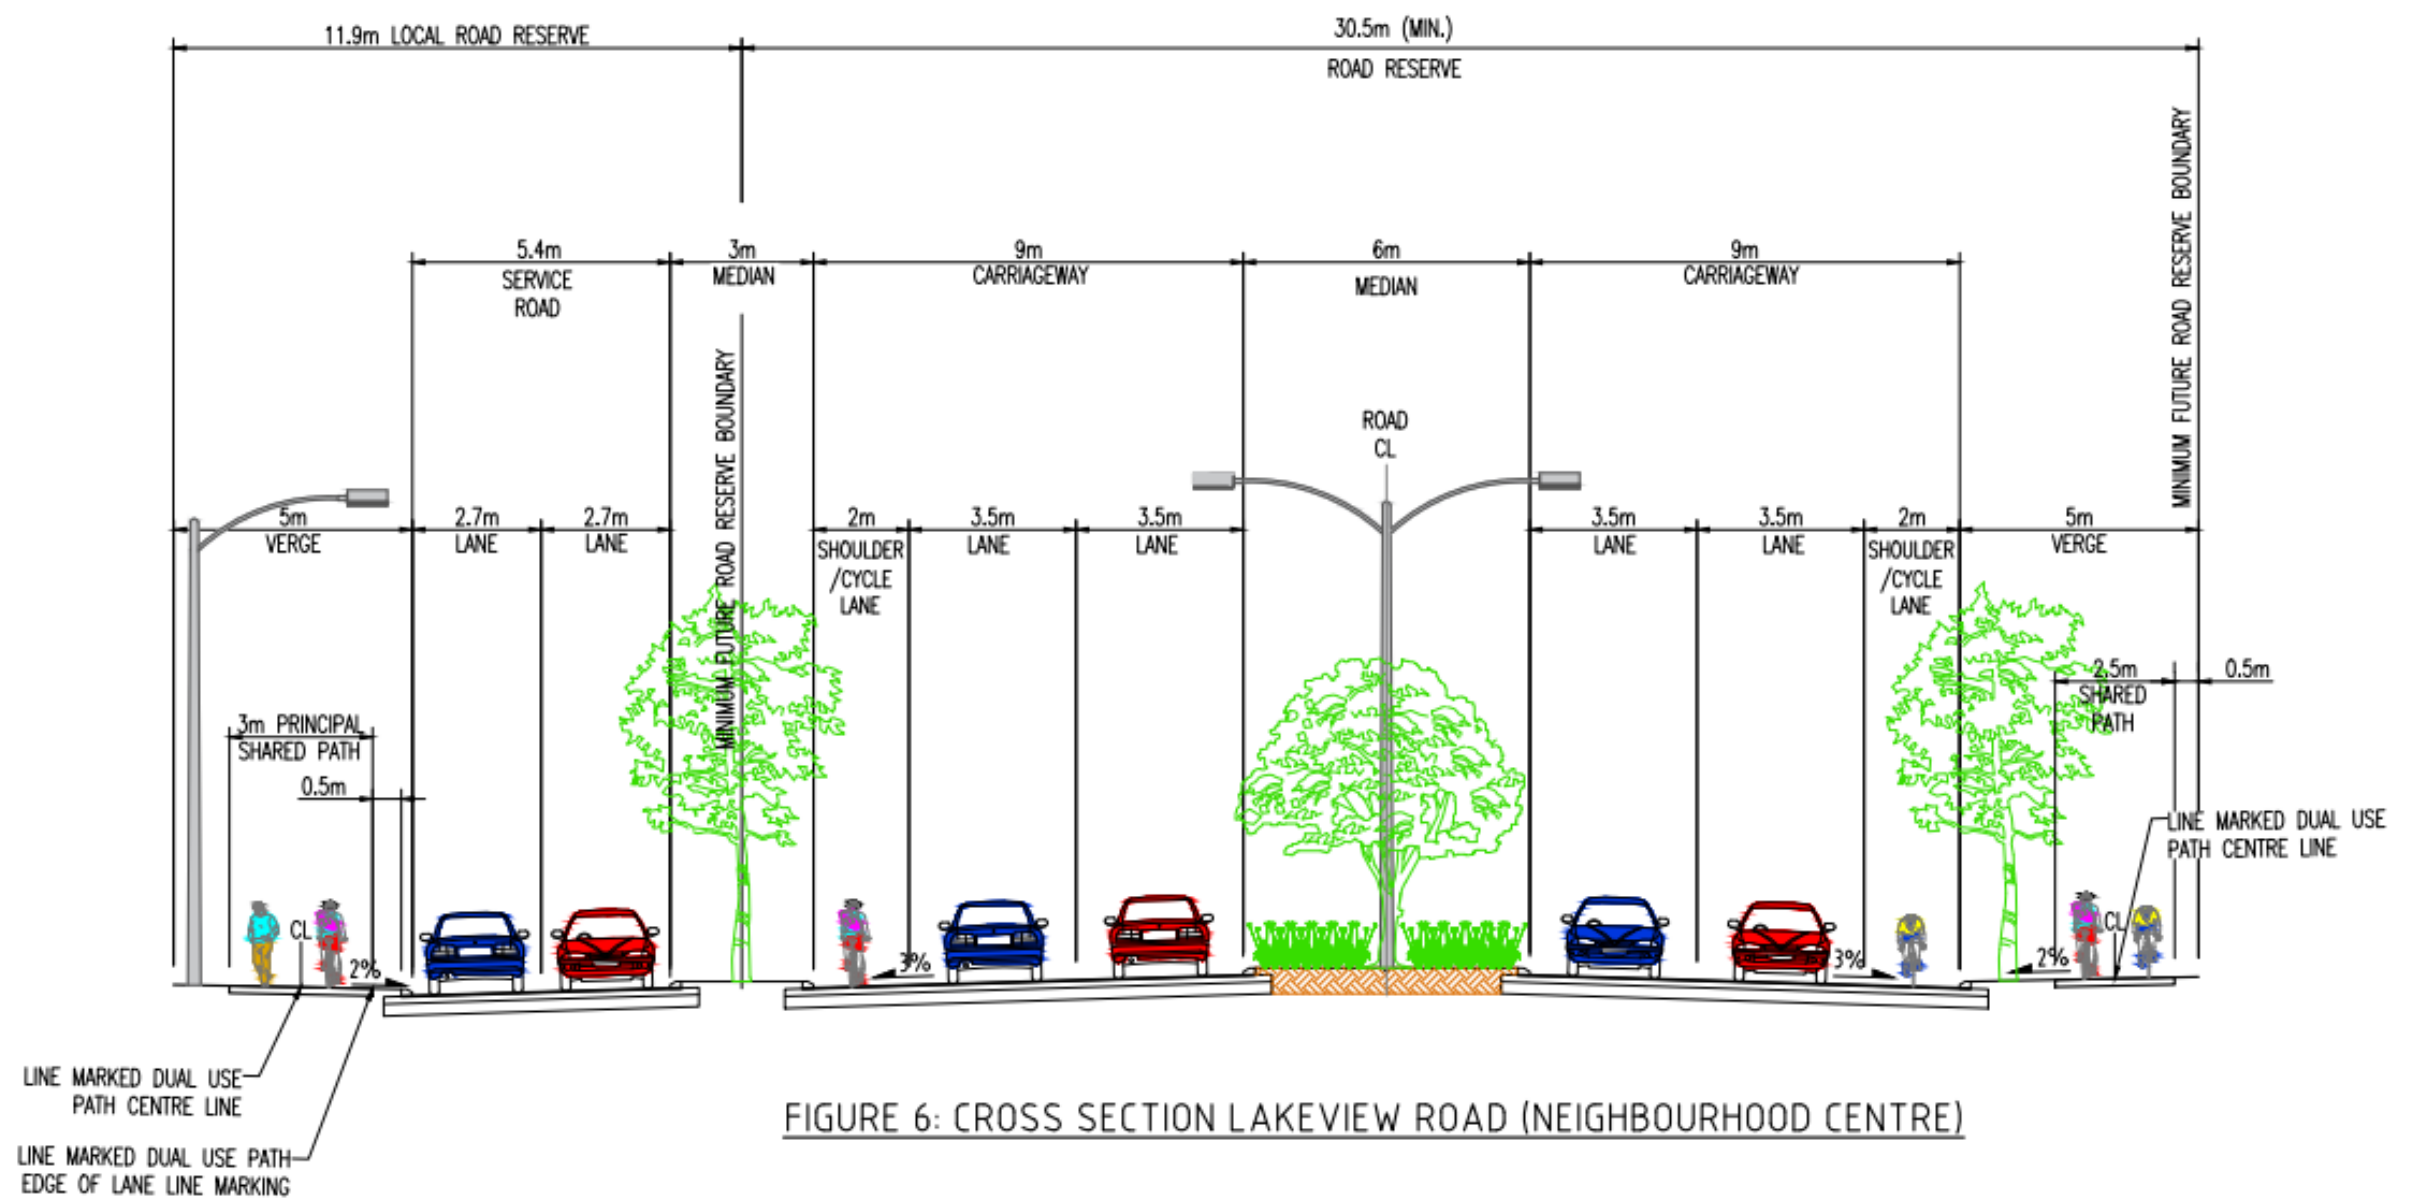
CROSS SECTION LAKEVIEW ROAD (NEIGHBOURHOOD CENTRE)
